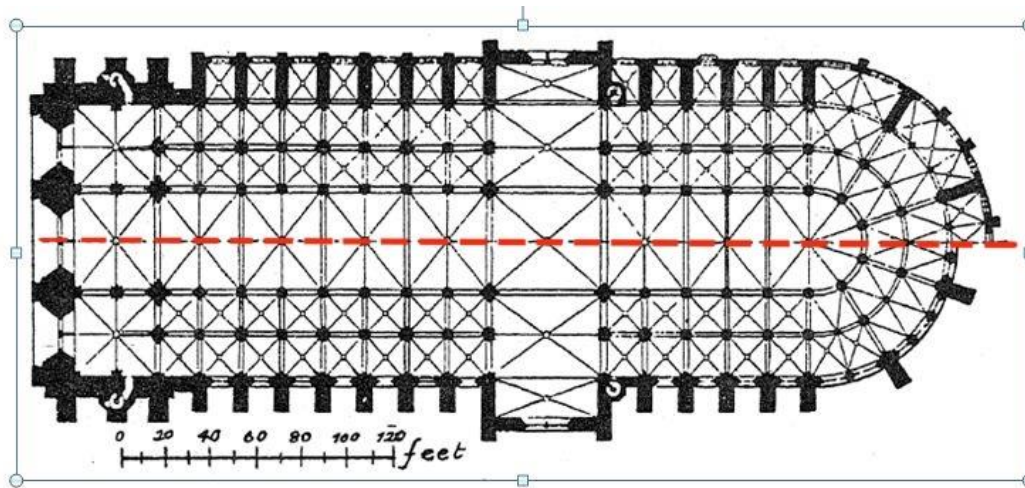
Nikolaus Pevsner's drawing of Notre Dame's plan. Top Half - Ground Floor;
